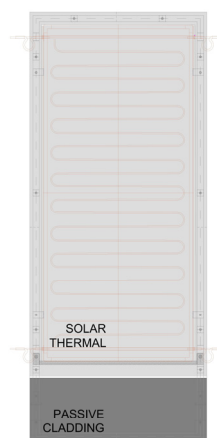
Front view of the ST integration in a dedicated macro panel with bottom passive cladding. In this case, an additional removable transom is foreseen as well as dedicated fixing points for the ST collector retention against horizontal loads
